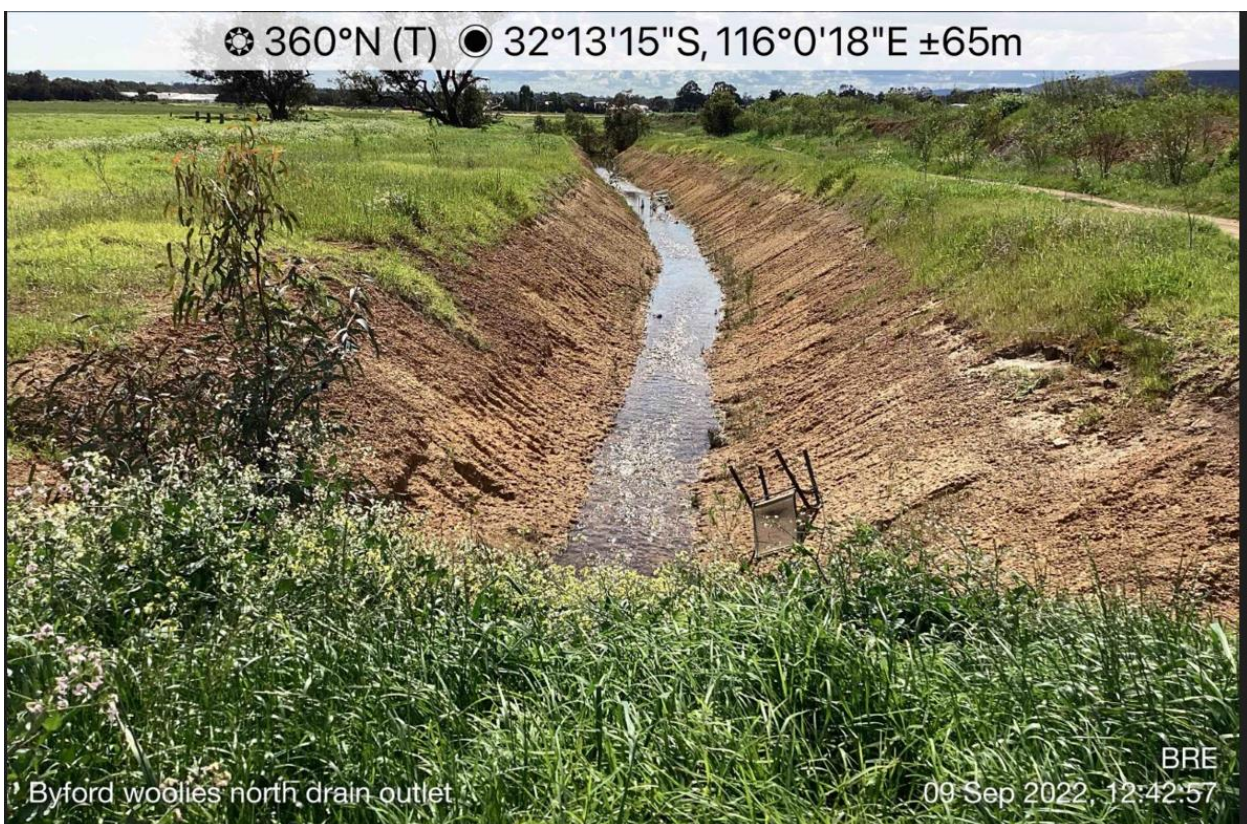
Splitter Culvert Temporary Outlet Drain
